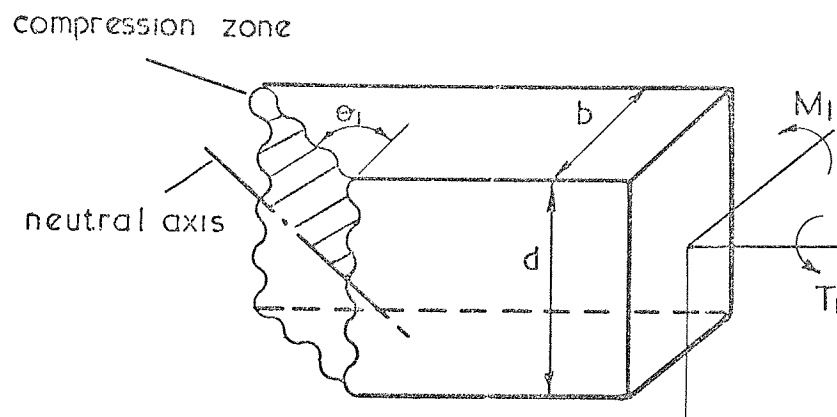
Mode I type of failure in plain concrete (no distortion)
